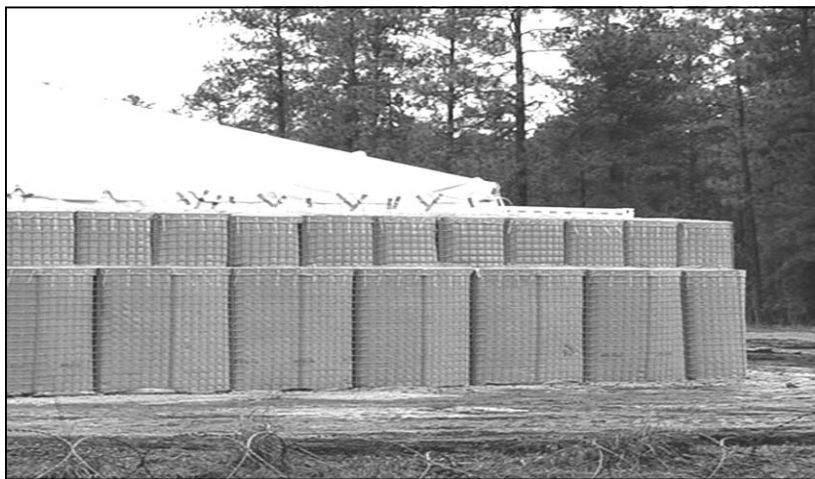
Soil-filled wire and fabric containers used for sidewall protection
